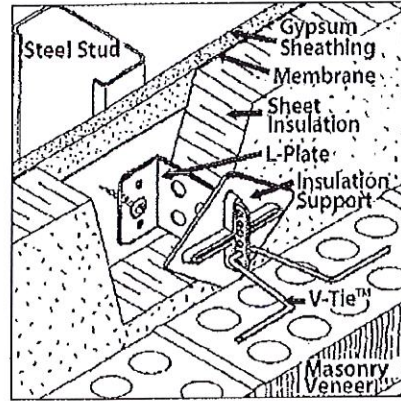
Rap-Tie Surface Mounted on Protected Gypsum Sheathing
